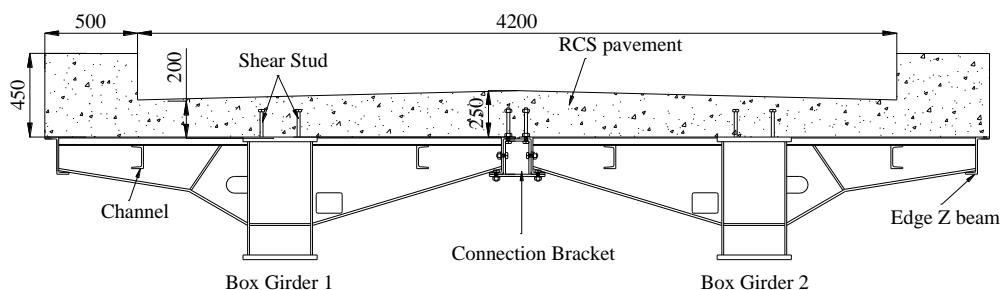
RCS pavement on top of FRW. Slab is connected to the main box girders by shear studs at 120 mm spacing in the longitudinal direction
